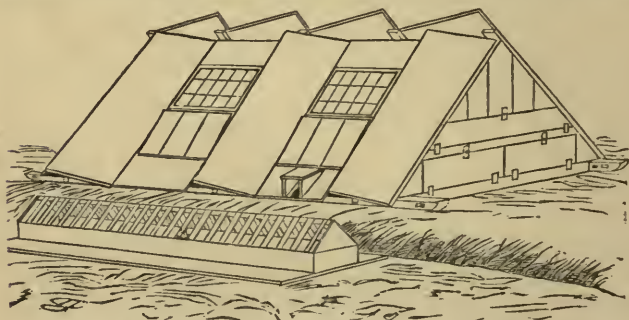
HOUSE FOR LAYERS—SUMMER ARRANGEMENT.
